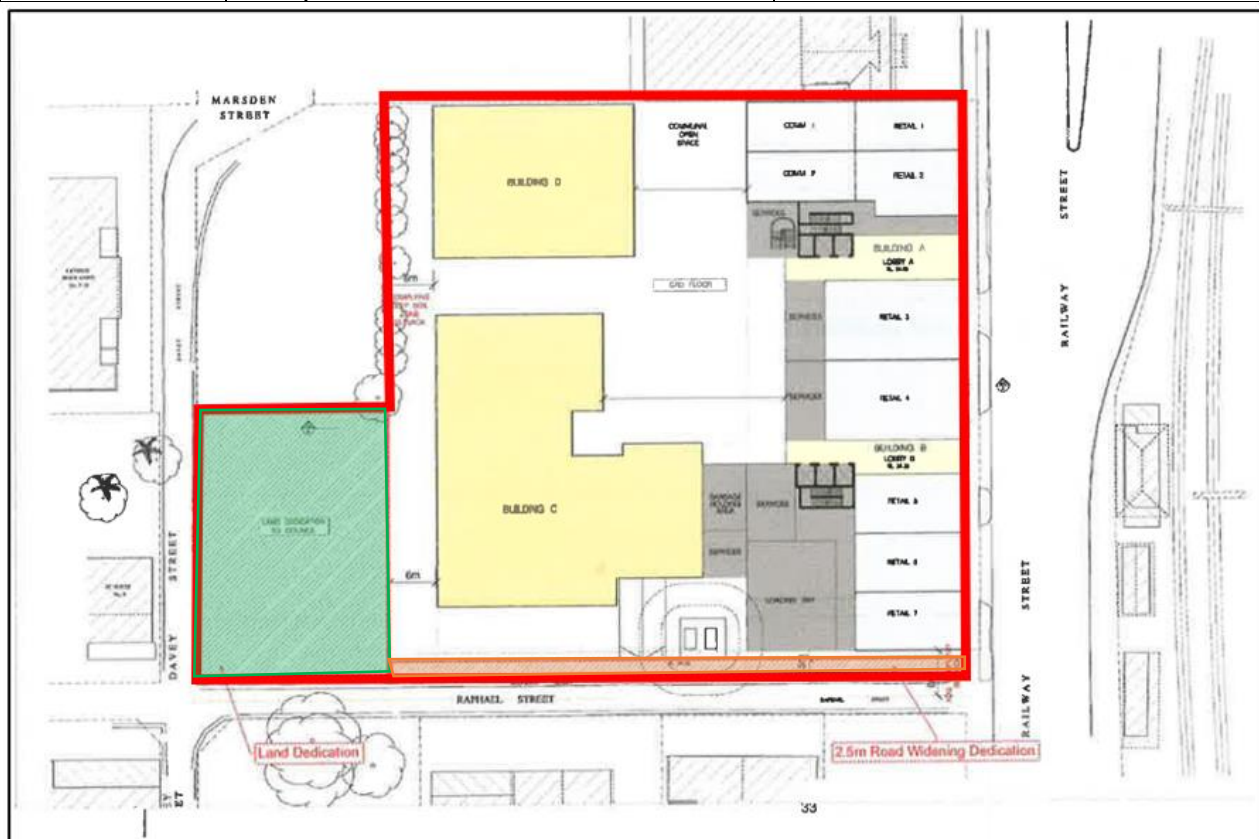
VPA Annexure 1 – Location Plan extract Lots 7 & 8 shaded green and road widening shaded orange (Source: Planning Agreement 4-12 Railway Street, Lidcombe, Marsdens Law Group)
